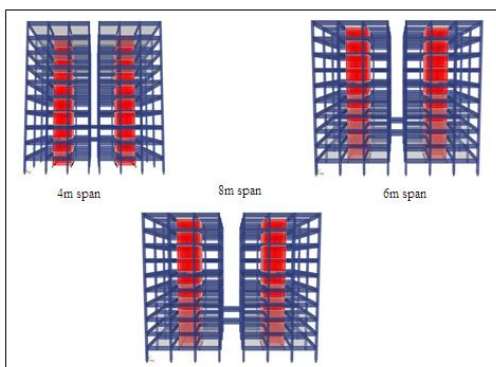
3D RENDERED VIEW OF MODEL WITH CORRIDOR CONNECTION AT 2nd storey
